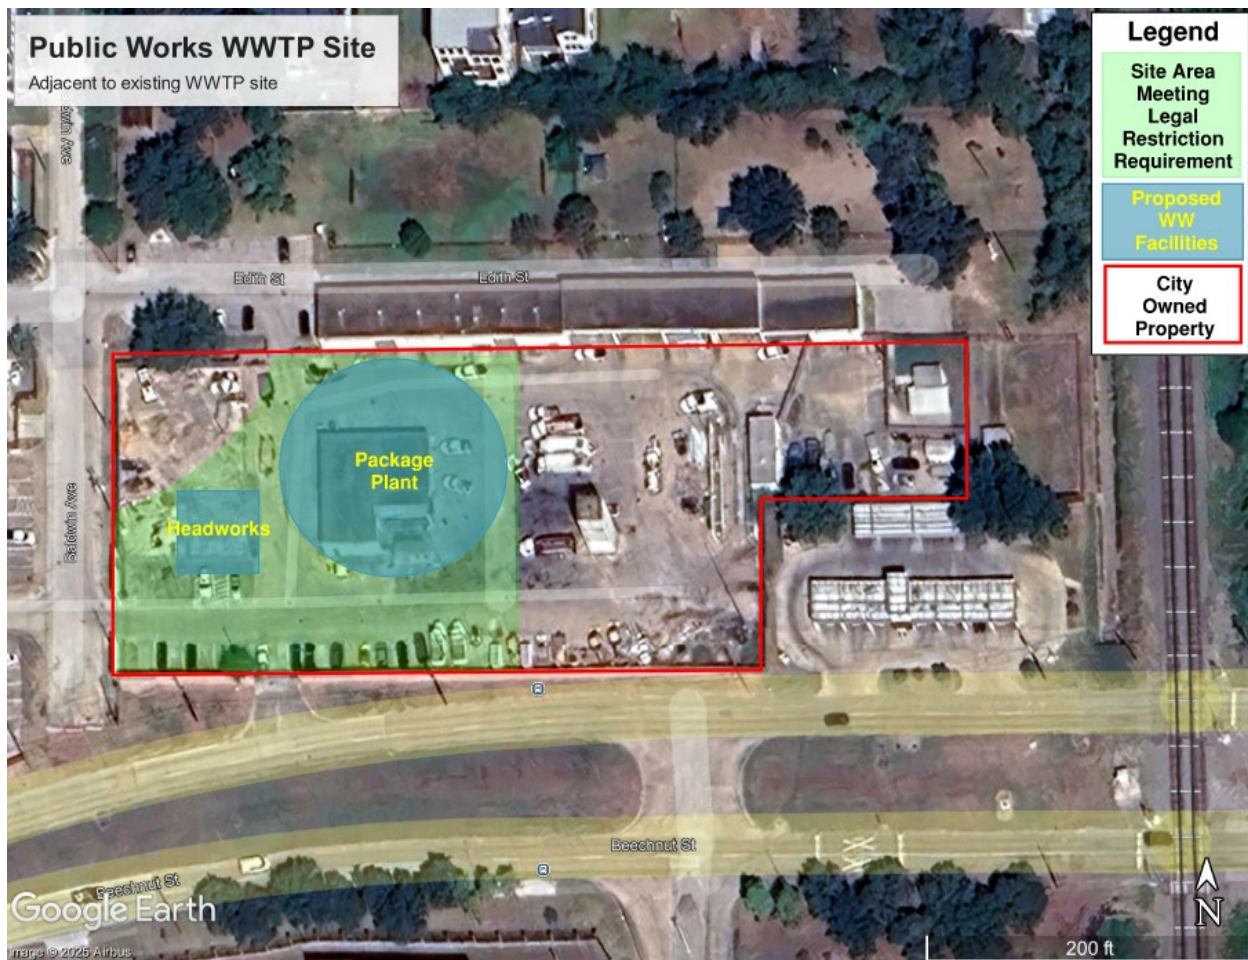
Proposed Site Plan for Public Works Site Alternative
